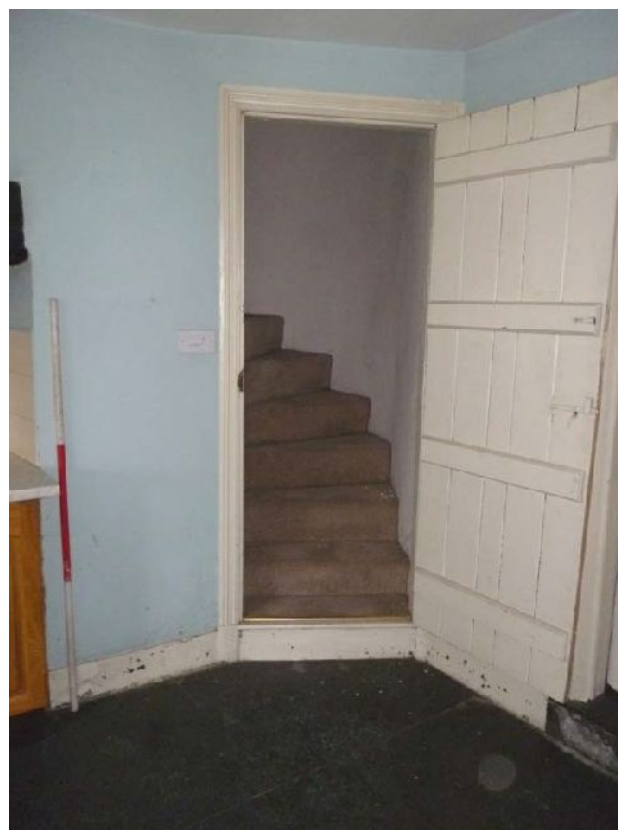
(right): Doorway and spiral stairs leading to first floor, north-west elevation, Room G6
